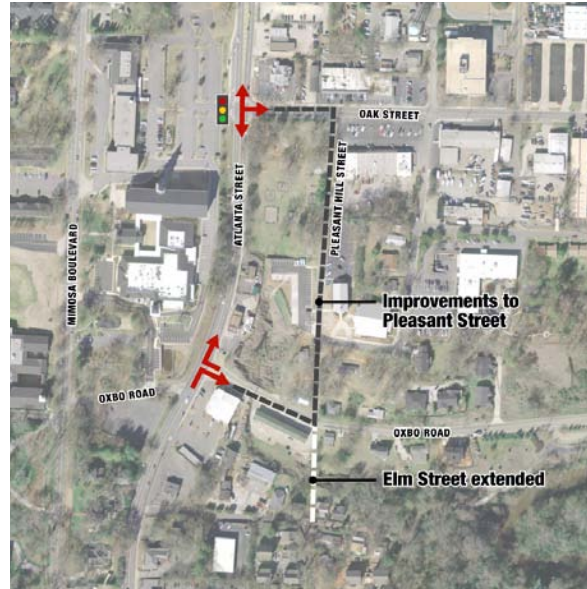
Oxo Road Proposal - Oxbo Road would be “right-in, right-out.” Left turns would be accommodated at Oak Street.
